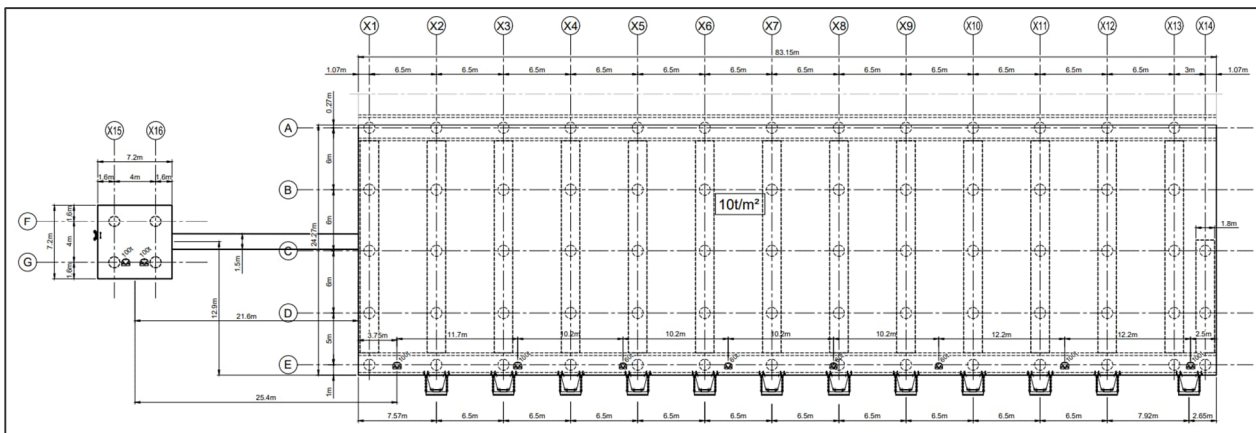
Smith Quay General Arrangement showing proposed pile layout.
